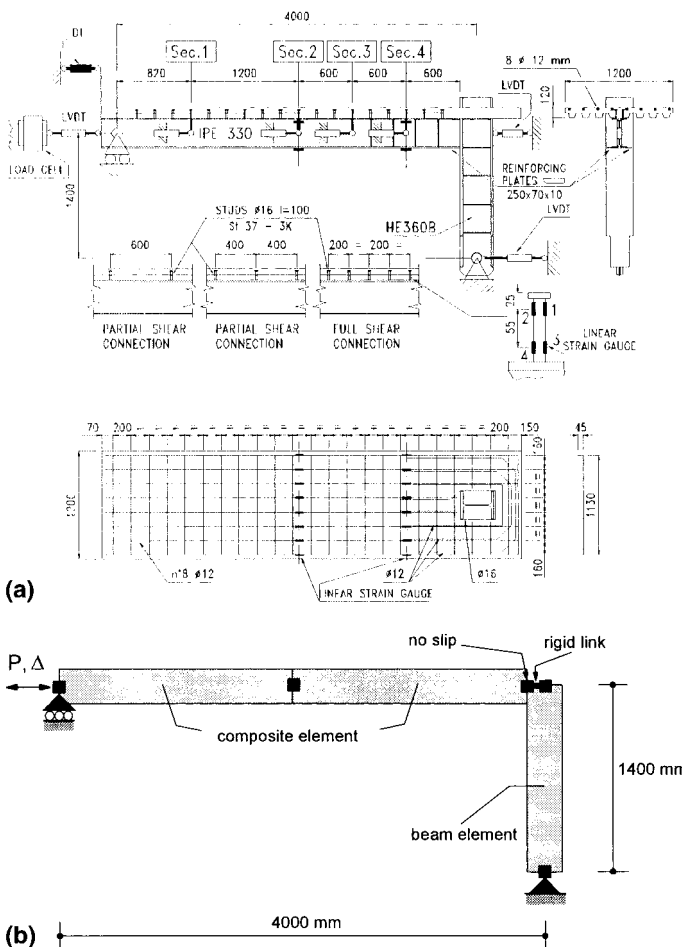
(a) Bursi and Ballerini Beam-Column Specimen (1996); (b) Model of Bursi and Ballerini Beam-Column Specimen (1996)
